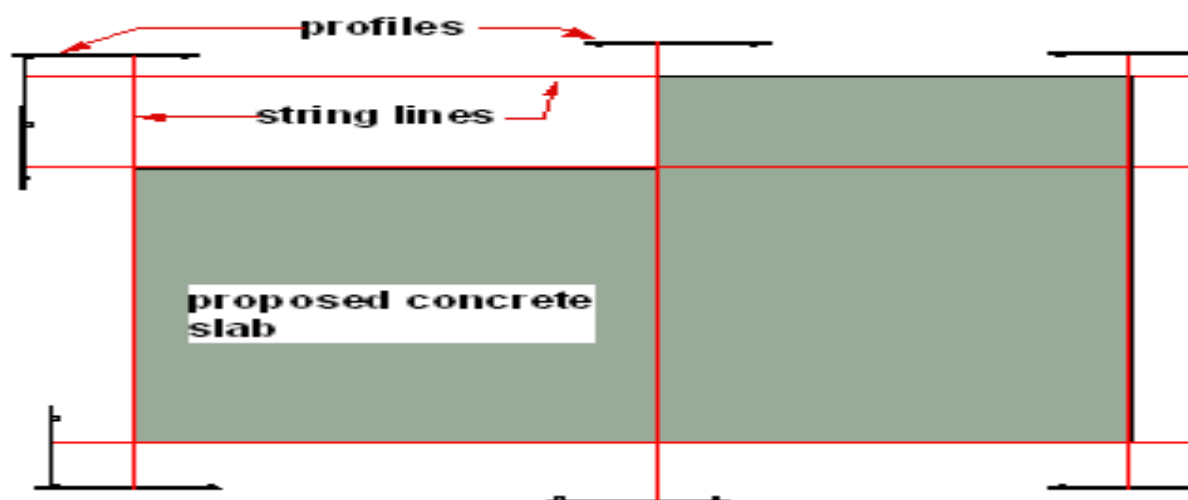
Setting out - A plan of a concrete slab is showing the profile positions.
